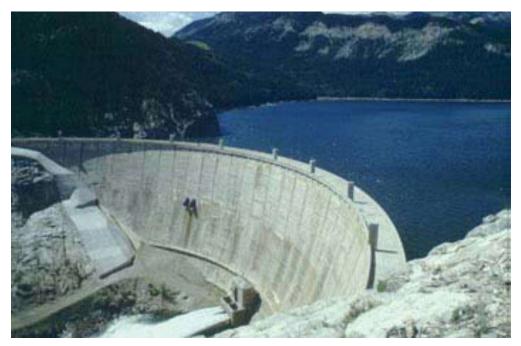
Downstream face of Gibson Dam, Montana (Reclamation).
